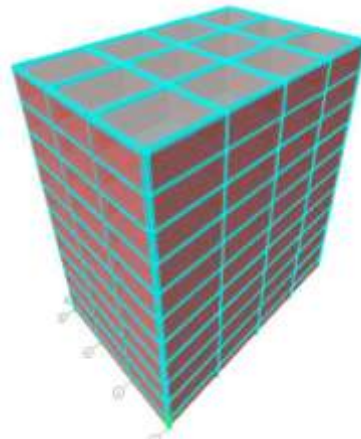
Model 3: G+10 RC building of full infill wall with slab element 3D view
